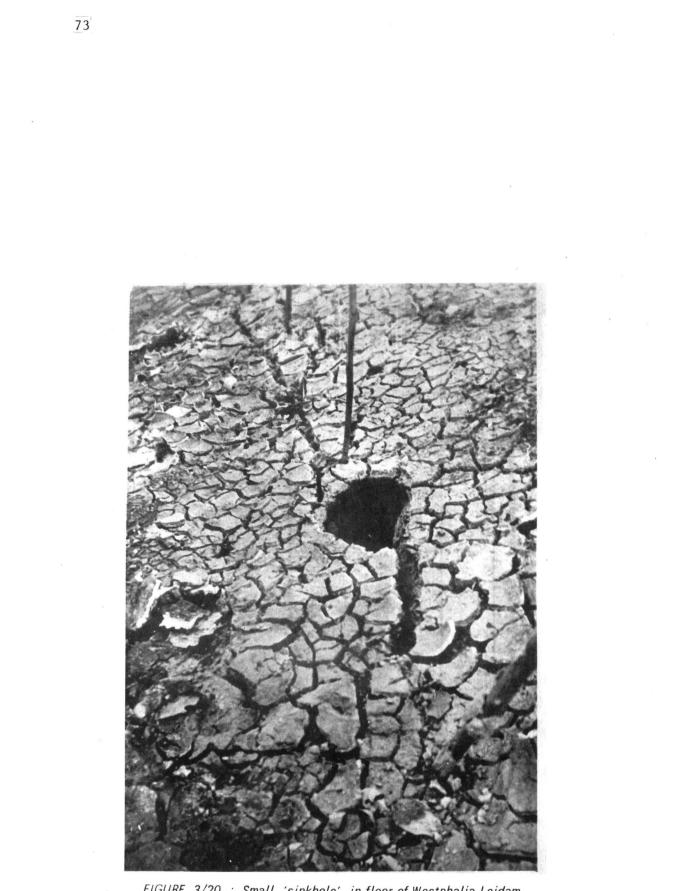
/20 : Small 'sinkhole' in floor of Westphalia Leidam
